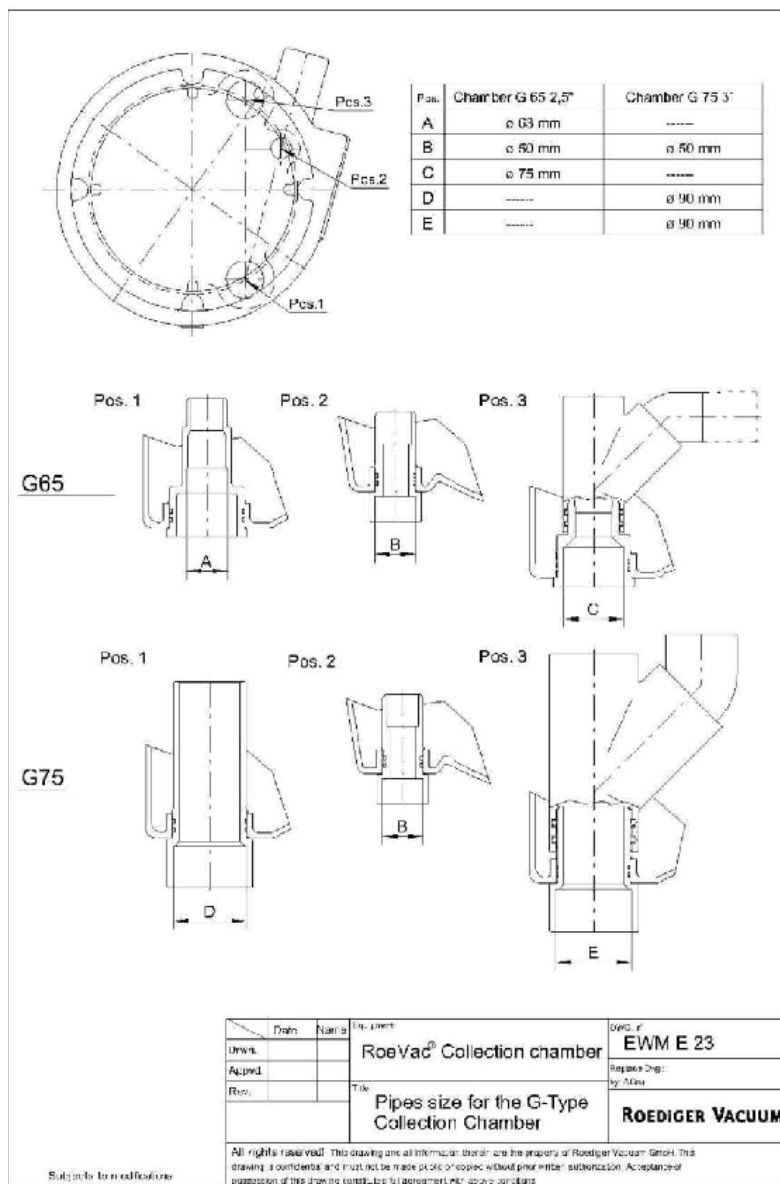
Collection chamber: pipes inside the valve chamber (vacuum, sensor and evacuation)
